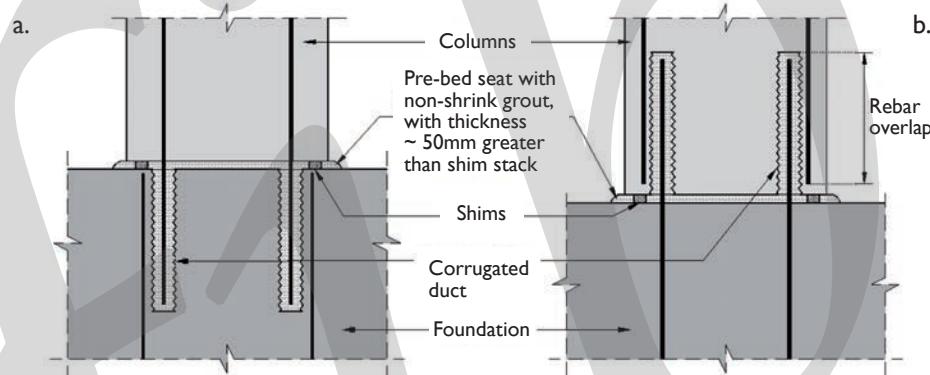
Column-to-foundation connections with corrugated metal ducts
